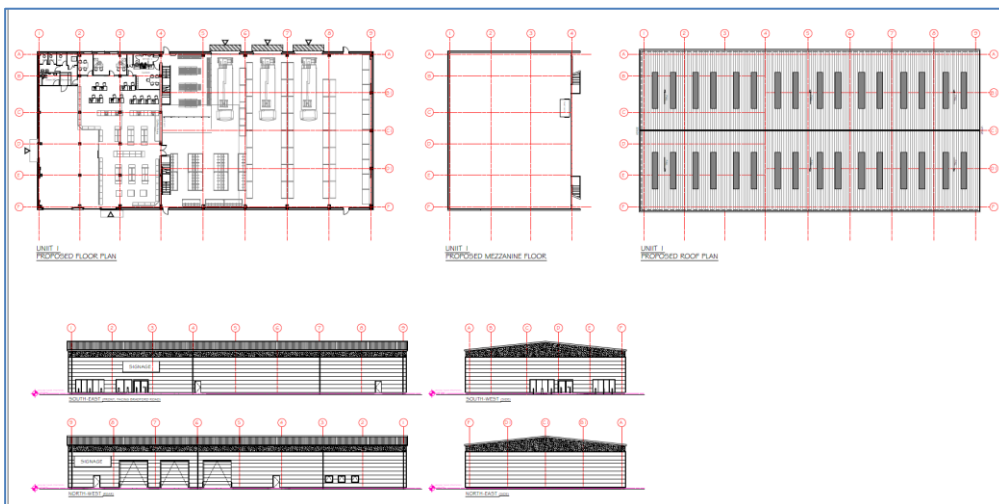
Proposed elevations, floor plan and roof plan for Unit 1
